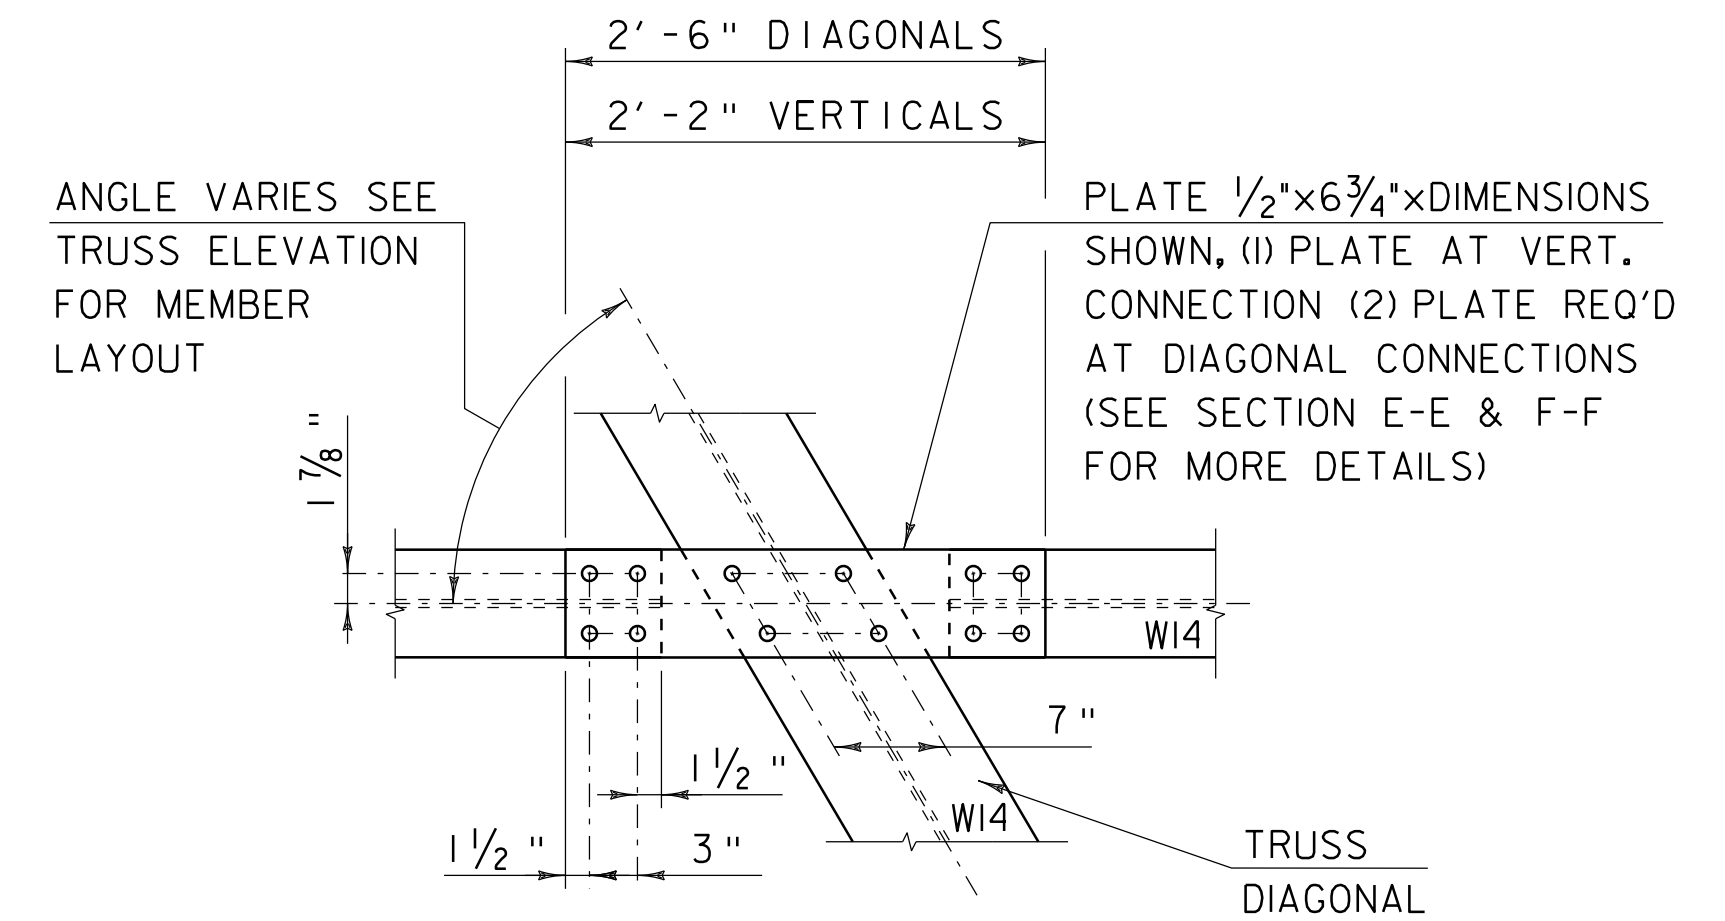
PLATE DIMENSIONS SHOWN MAY BE ADJUSTED BY FABRICATOR TO ACHIEVE PROPER FIT AND CLEARANCE AS REQUIRED.
